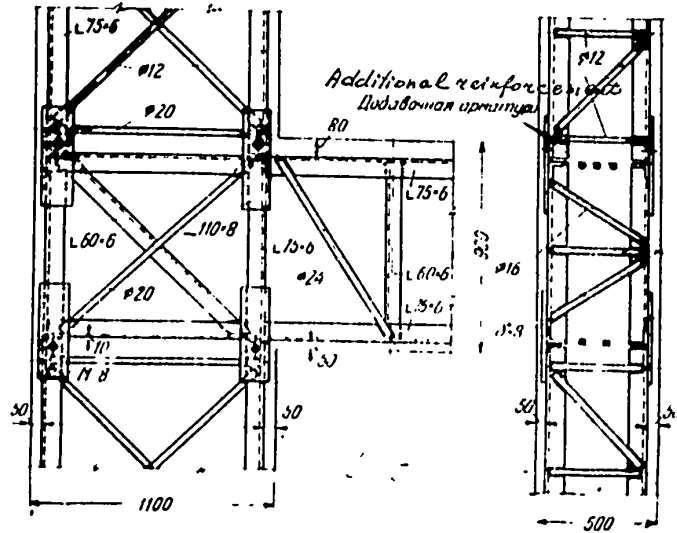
Connection between the steel welded skeletons of a cross girder and a column.
